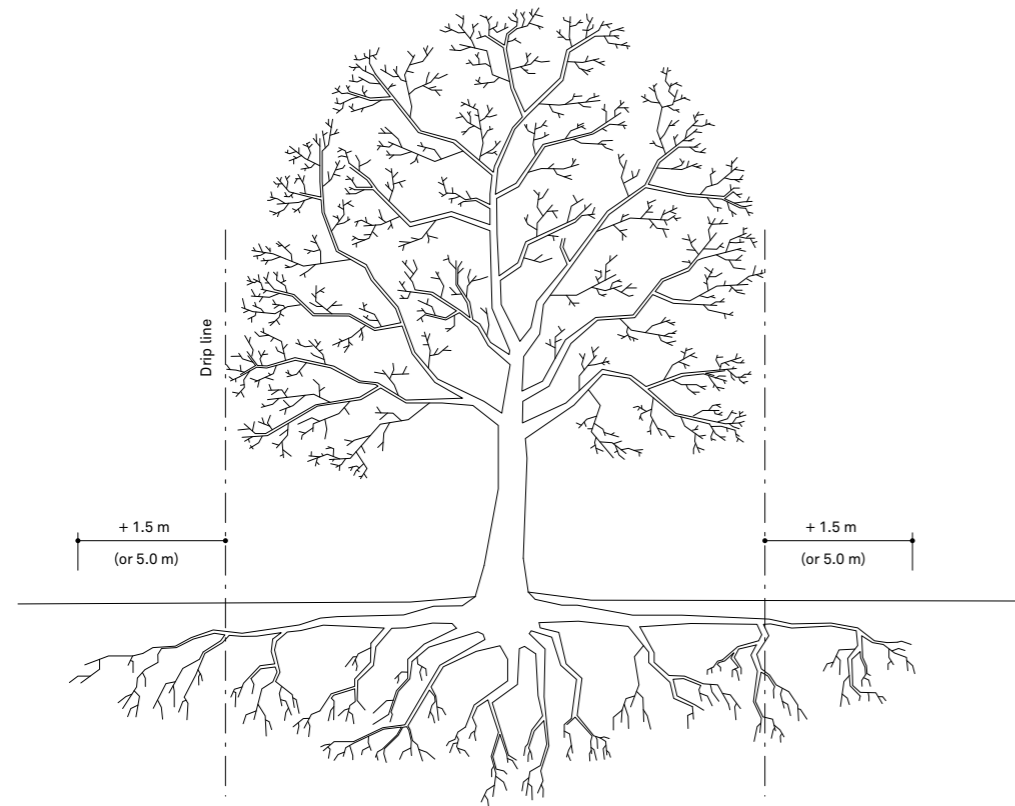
Protection for the root zone of existing trees (tree protection zone)
